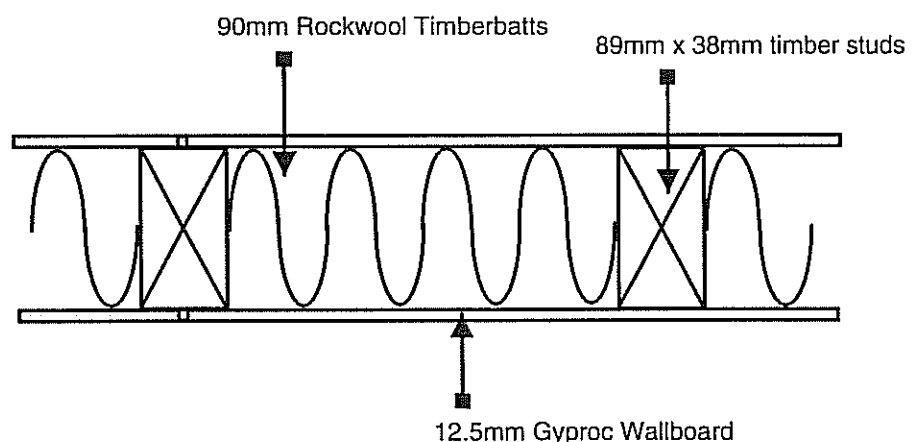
Use of Rockwool within the timber stud to provide 60 minutes fire resistance
